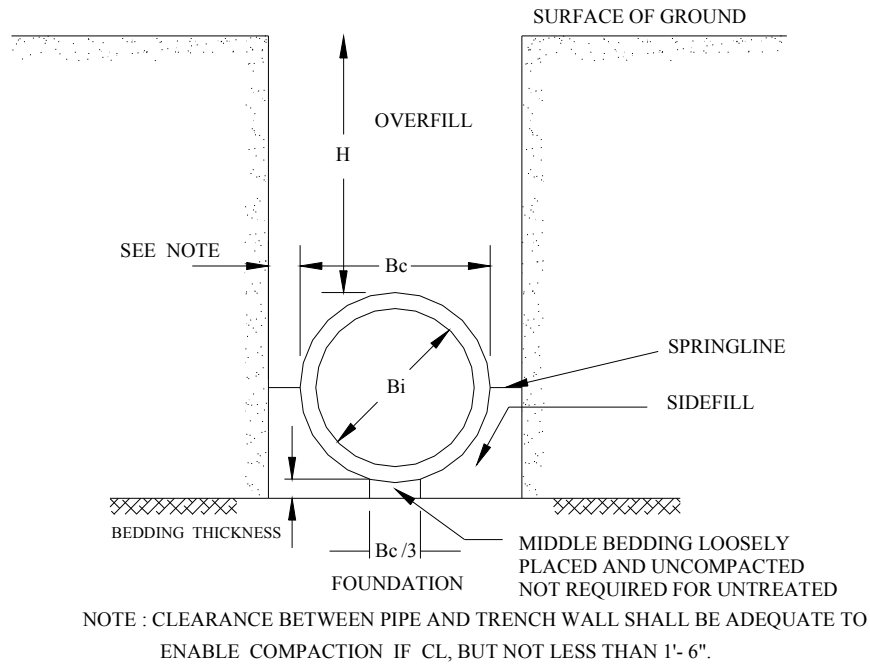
Proposed Trench Installations for Concrete Round Pipes
